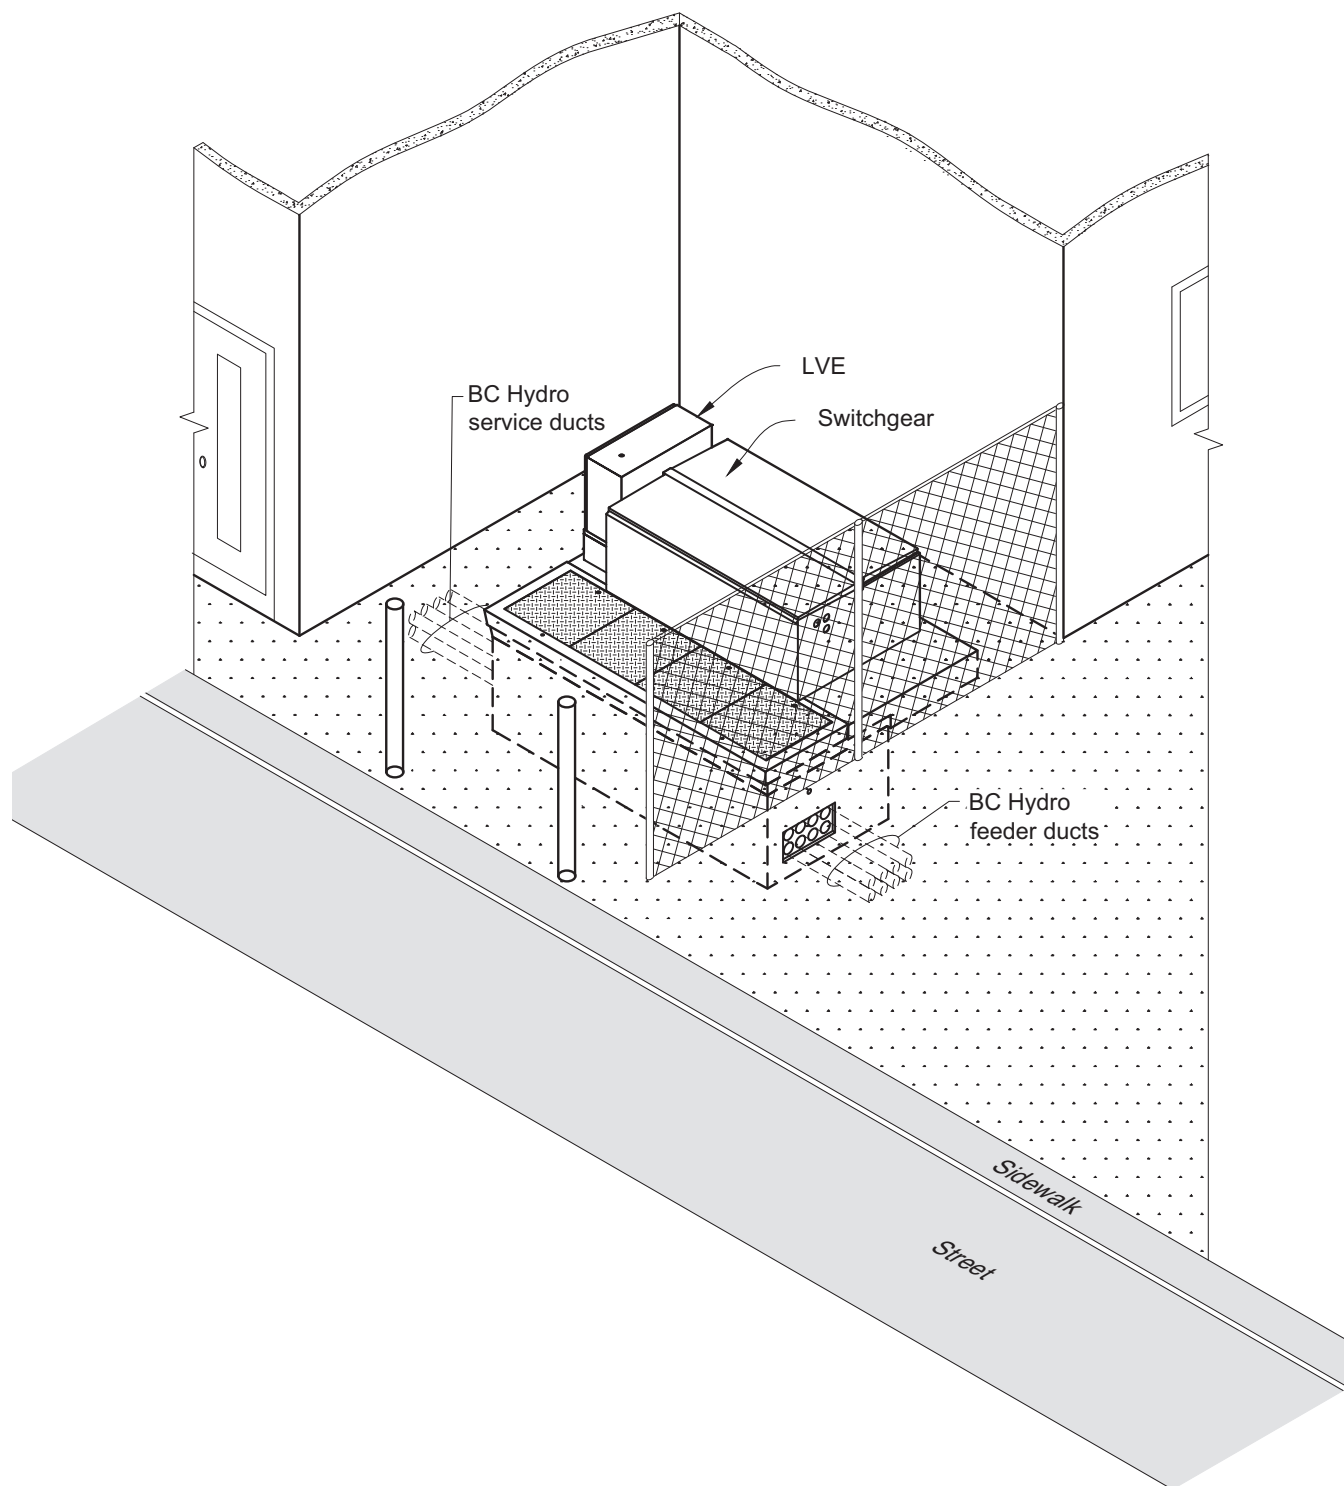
Pad-mounted switchgear on suitable backfill within 3 m of building structure
